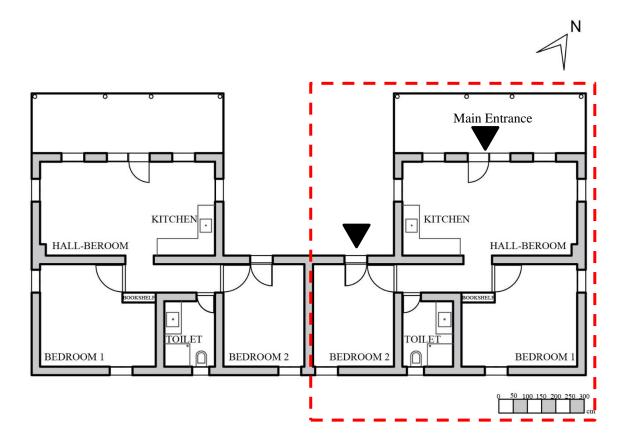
Plan of the case building study in Fethiye, Mugla
